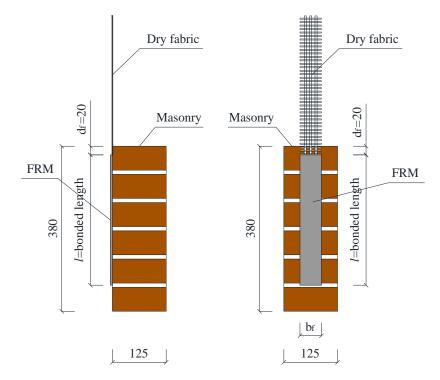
Specimen Dimensions and Details of Bonded composite system (masonry specimens).
